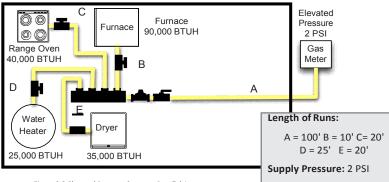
Elevated Pressure System—Parallel Arrangement
